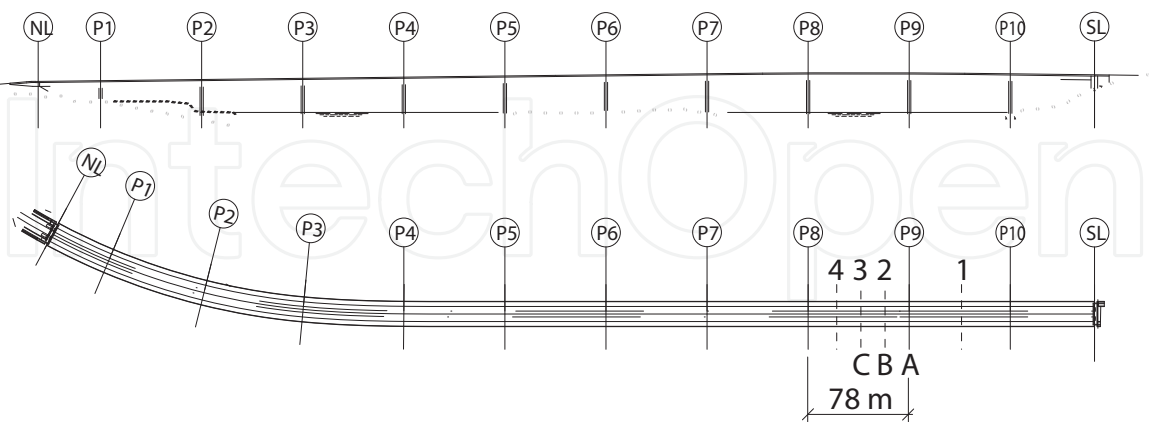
Elevation and plan view of the New Årsta Bridge. Between the northern and southern abutment, NL and SL, respectively, the 10 piers are designated P1 to P10. Strain and acceleration sensor sections are marked A, B and C. Section 1, 2, 3 and 4 were used for vertical deflection measurements.
